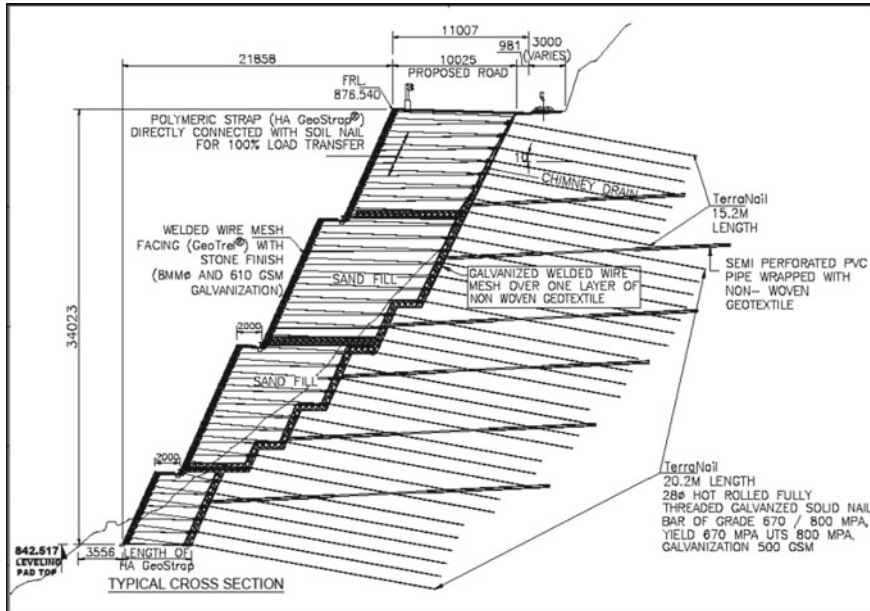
Typical detailed cross section of maximum restored height of valley slope at “Tindharia I”. Courtesy M/s. Reinforced Earth India Pvt. Ltd
